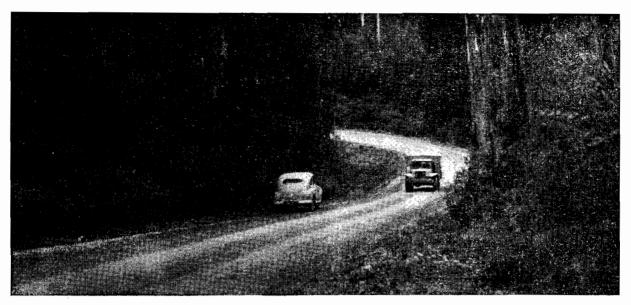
The altered route of the Warburton-Woods Point Road, rendered necessary by the construction of the Upper Yarra Dam, follows the Reefton Spur and then the old Yarra Track to Woods Point. A corner of the new Reefton Spur Road is pictured above.
